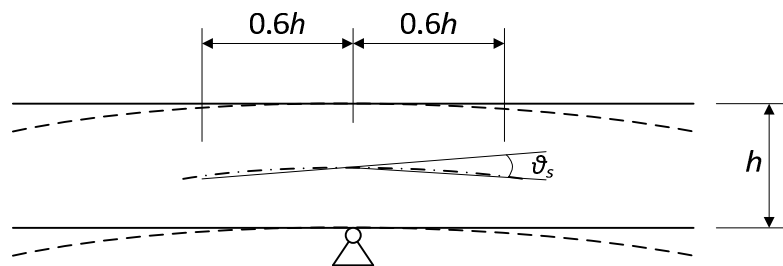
Plastic rotation ϑ_s of reinforced concrete sections for continuous beams and continuous one way spanning slabs (FIB Model Code (2), 2010: 13).
